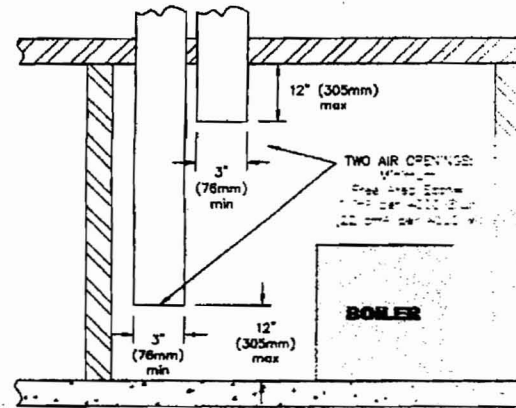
Air Openings - All Air from Outdoors through Vertical Ducts
